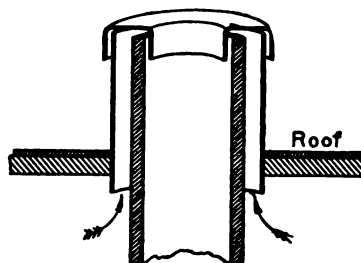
Pipe Flashing Capped with V-Ring of Lead and Providing Egress for Warm Air from Attic.
